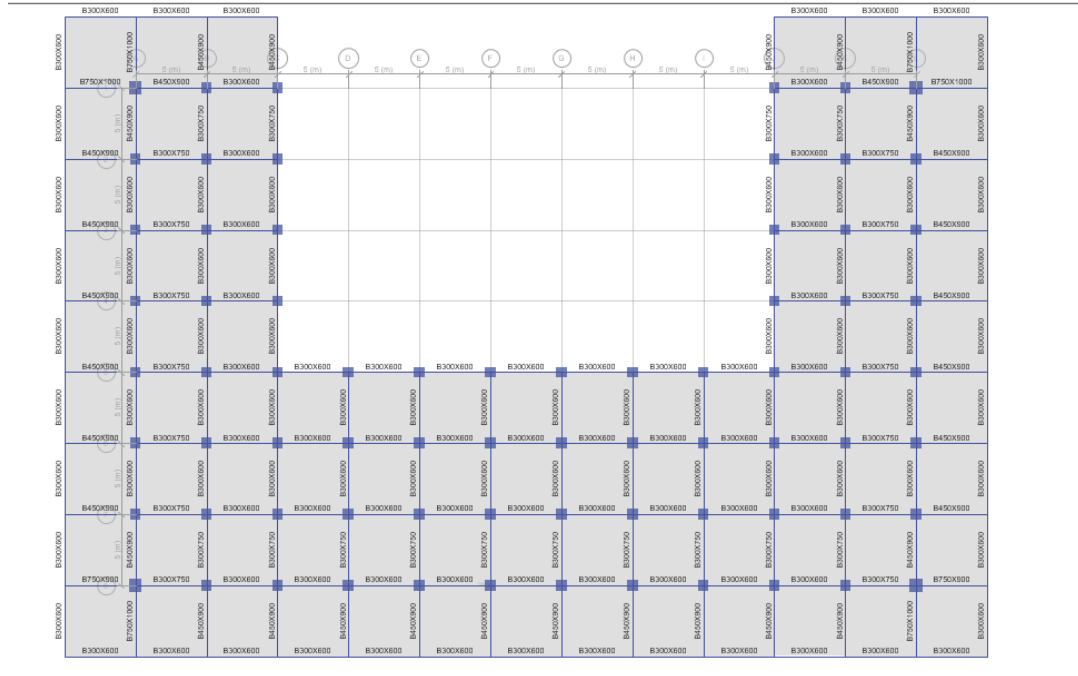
Unsymmetrical structure plan storey 9 & above.
